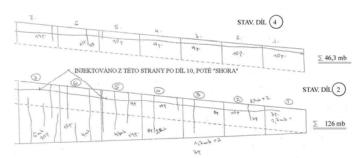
Technical record keeper of cracks on the internal face of the wall (cut)
